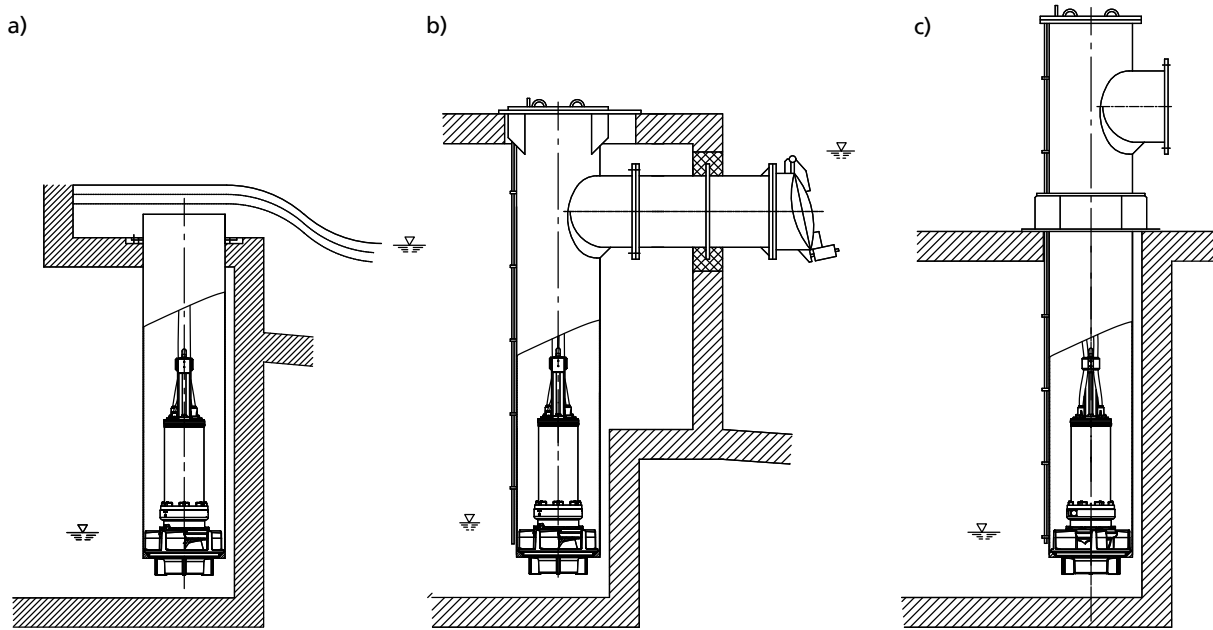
Overview of installation types a) BU installation (overflow design) b) CU installation (design with underfloor discharge) c) DU installation (design with above-floor discharge nozzle)
